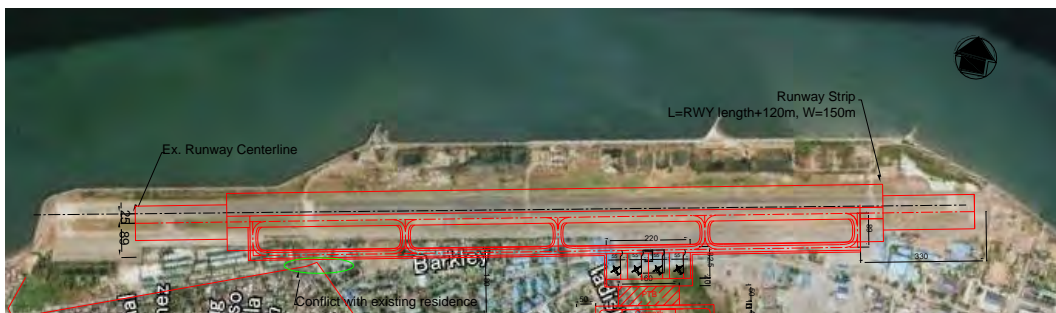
Runway Layout Plan Case-2
